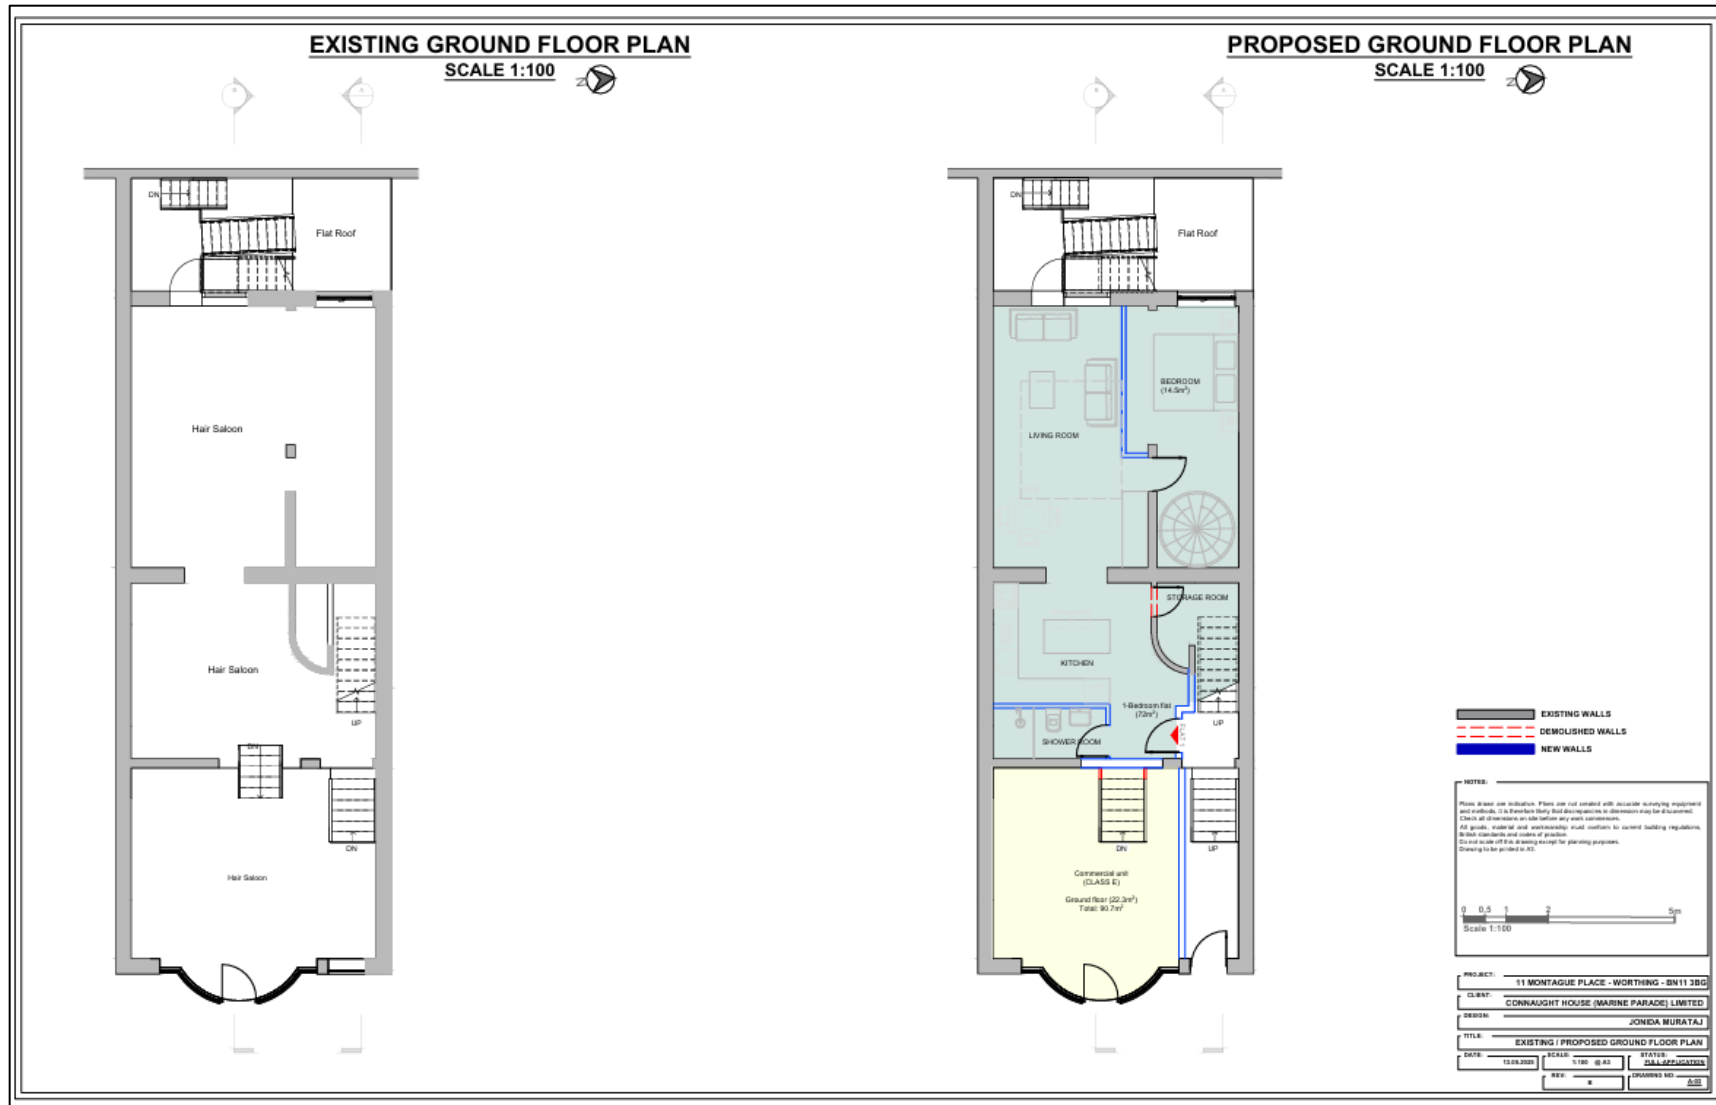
Existing and Proposed Site Floor Plans – Ground Floor
